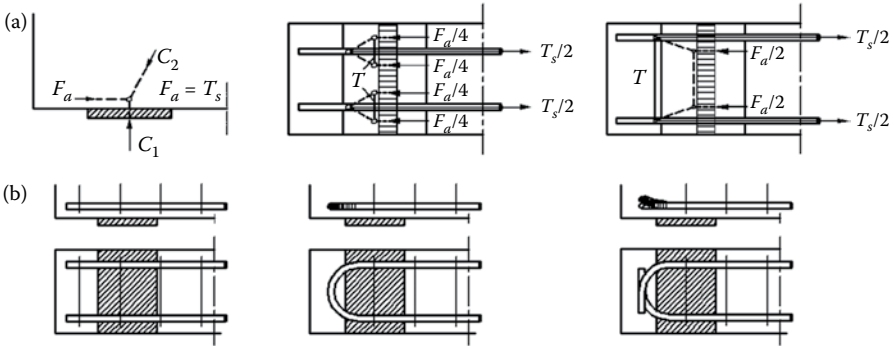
Distribution of anchor forces perpendicular to the plane of deep beam: (a) *STMs* of two different reinforcement patterns and (b) transverse reinforcement to cover the tensile forces perpendicular to the plane of the deep beam. (From Schlaich, J., and Schäfer K., *IABSE Workshop*, New Delhi, 1993.)
